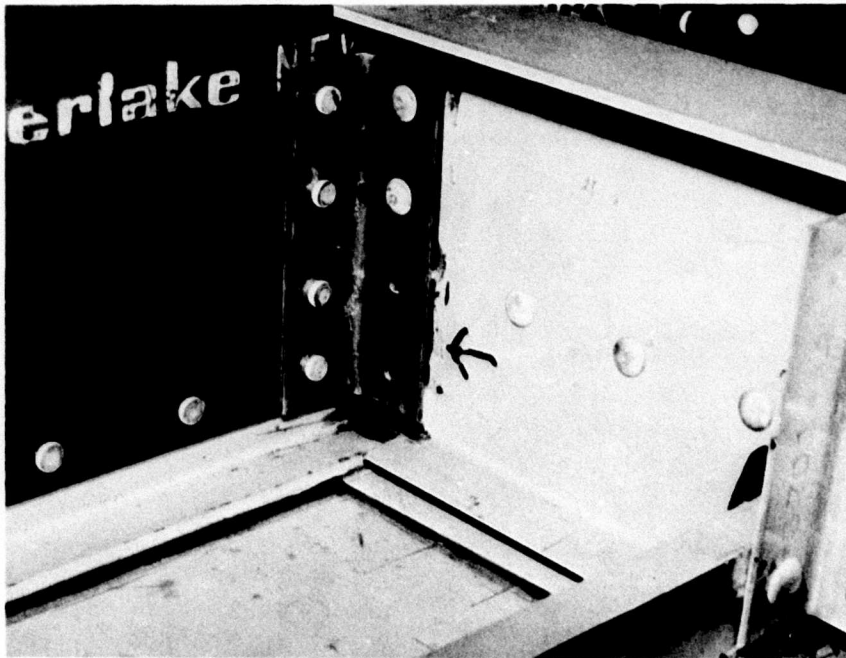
Angle Clip Failure at Steel Frame of Panel A-5-2
